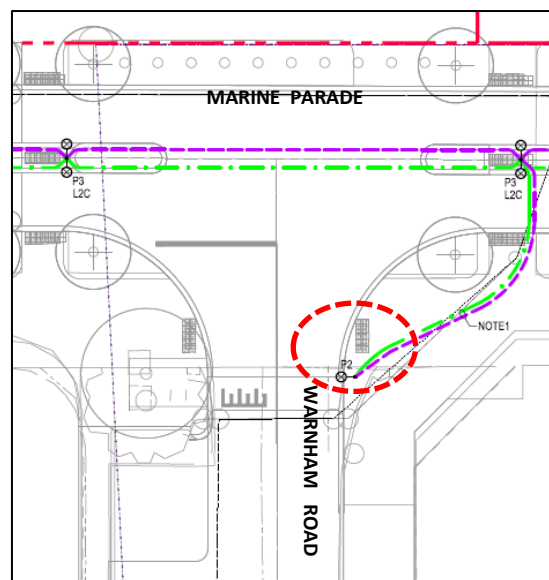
Foreshore Masterplan - Streetlight Placement at North-East Corners of Marine Parade Intersections
